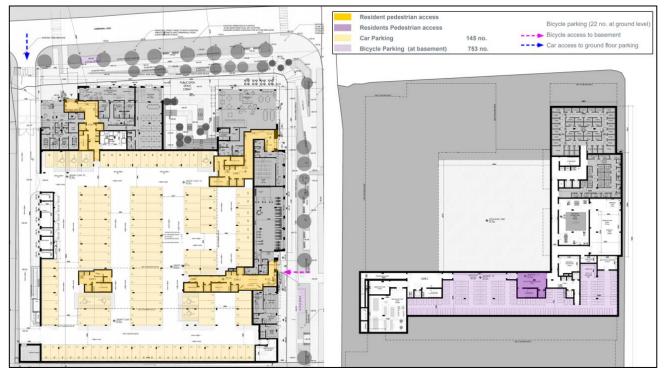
Car and Bicycle parking layout. Ground floor (left) and Basement (right). BKD Architects.
